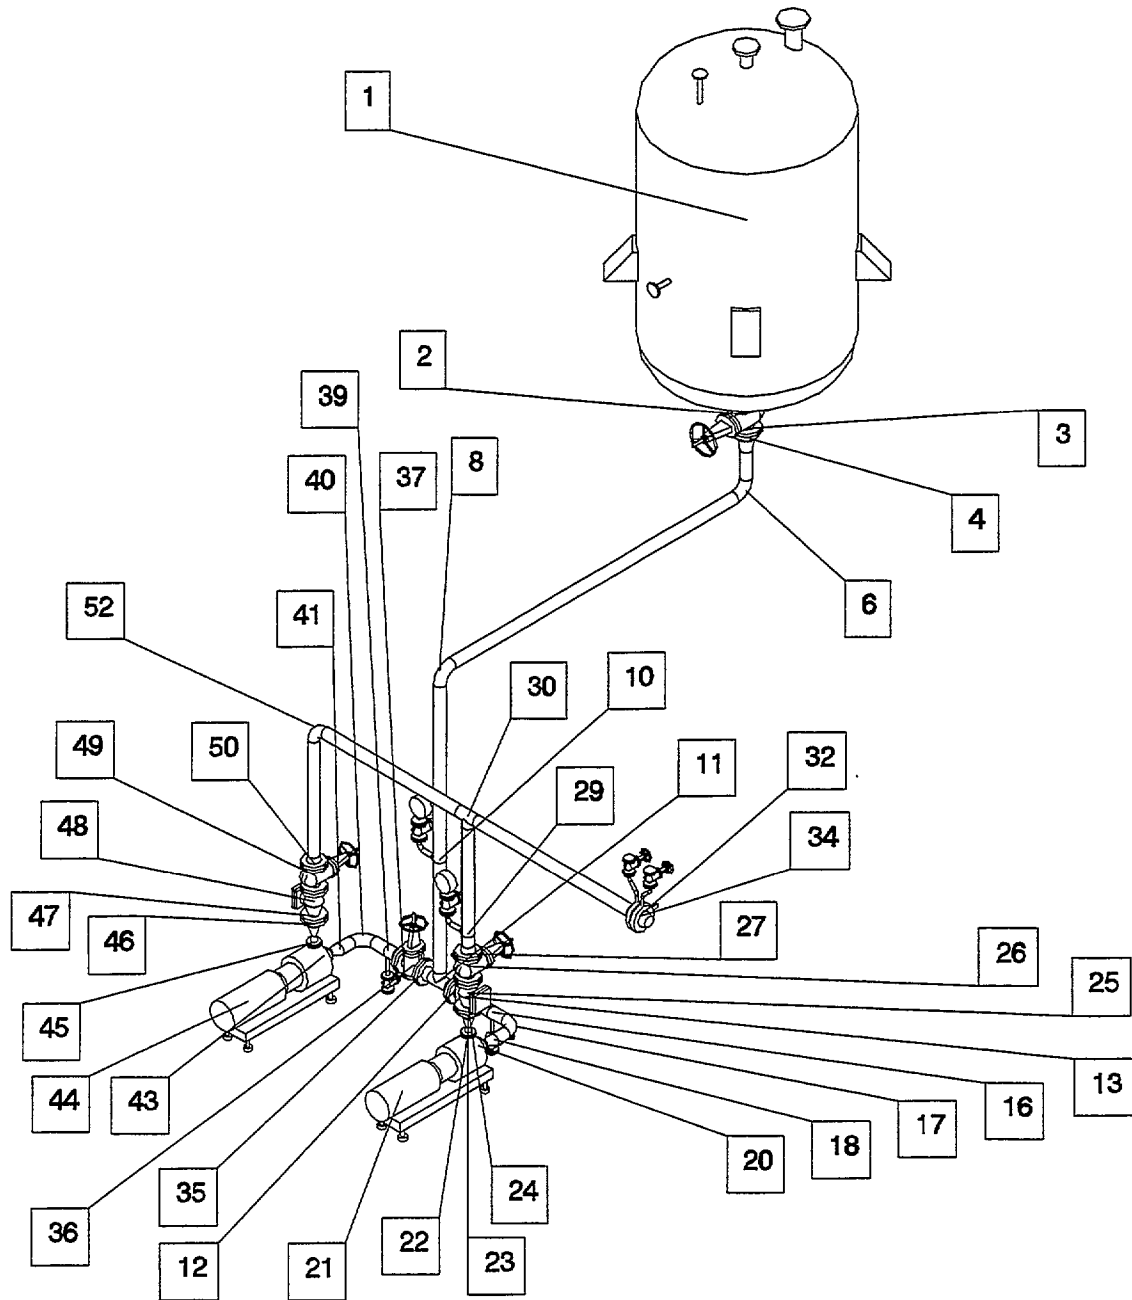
Modified Piping Arrangement - Perspective View
